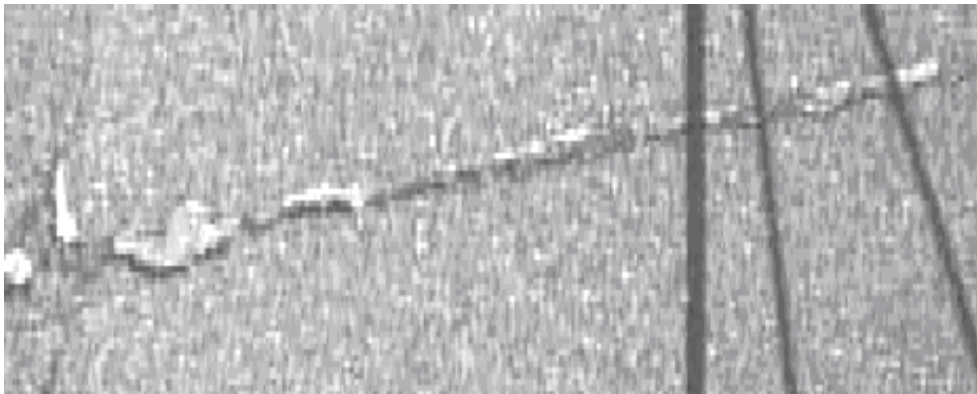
Close-up of transverse crack on I-94 section, photo taken summer of 2008.
